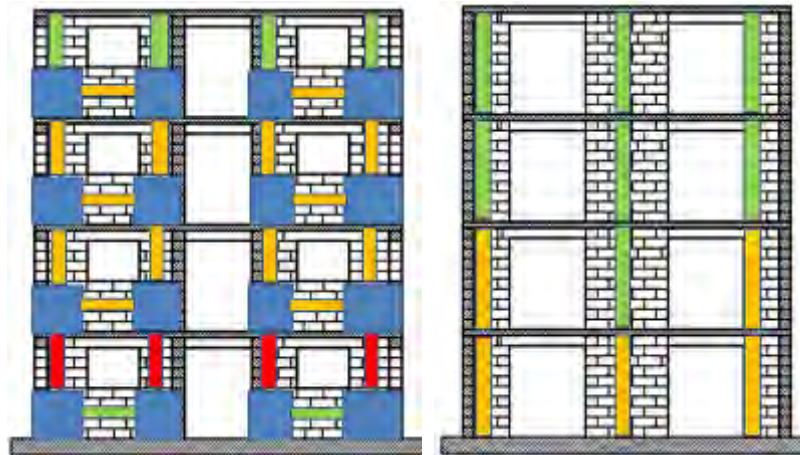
Status of link element in step 23 (42,75 mm). North elevation (on the left) and south elevation (on the right).
